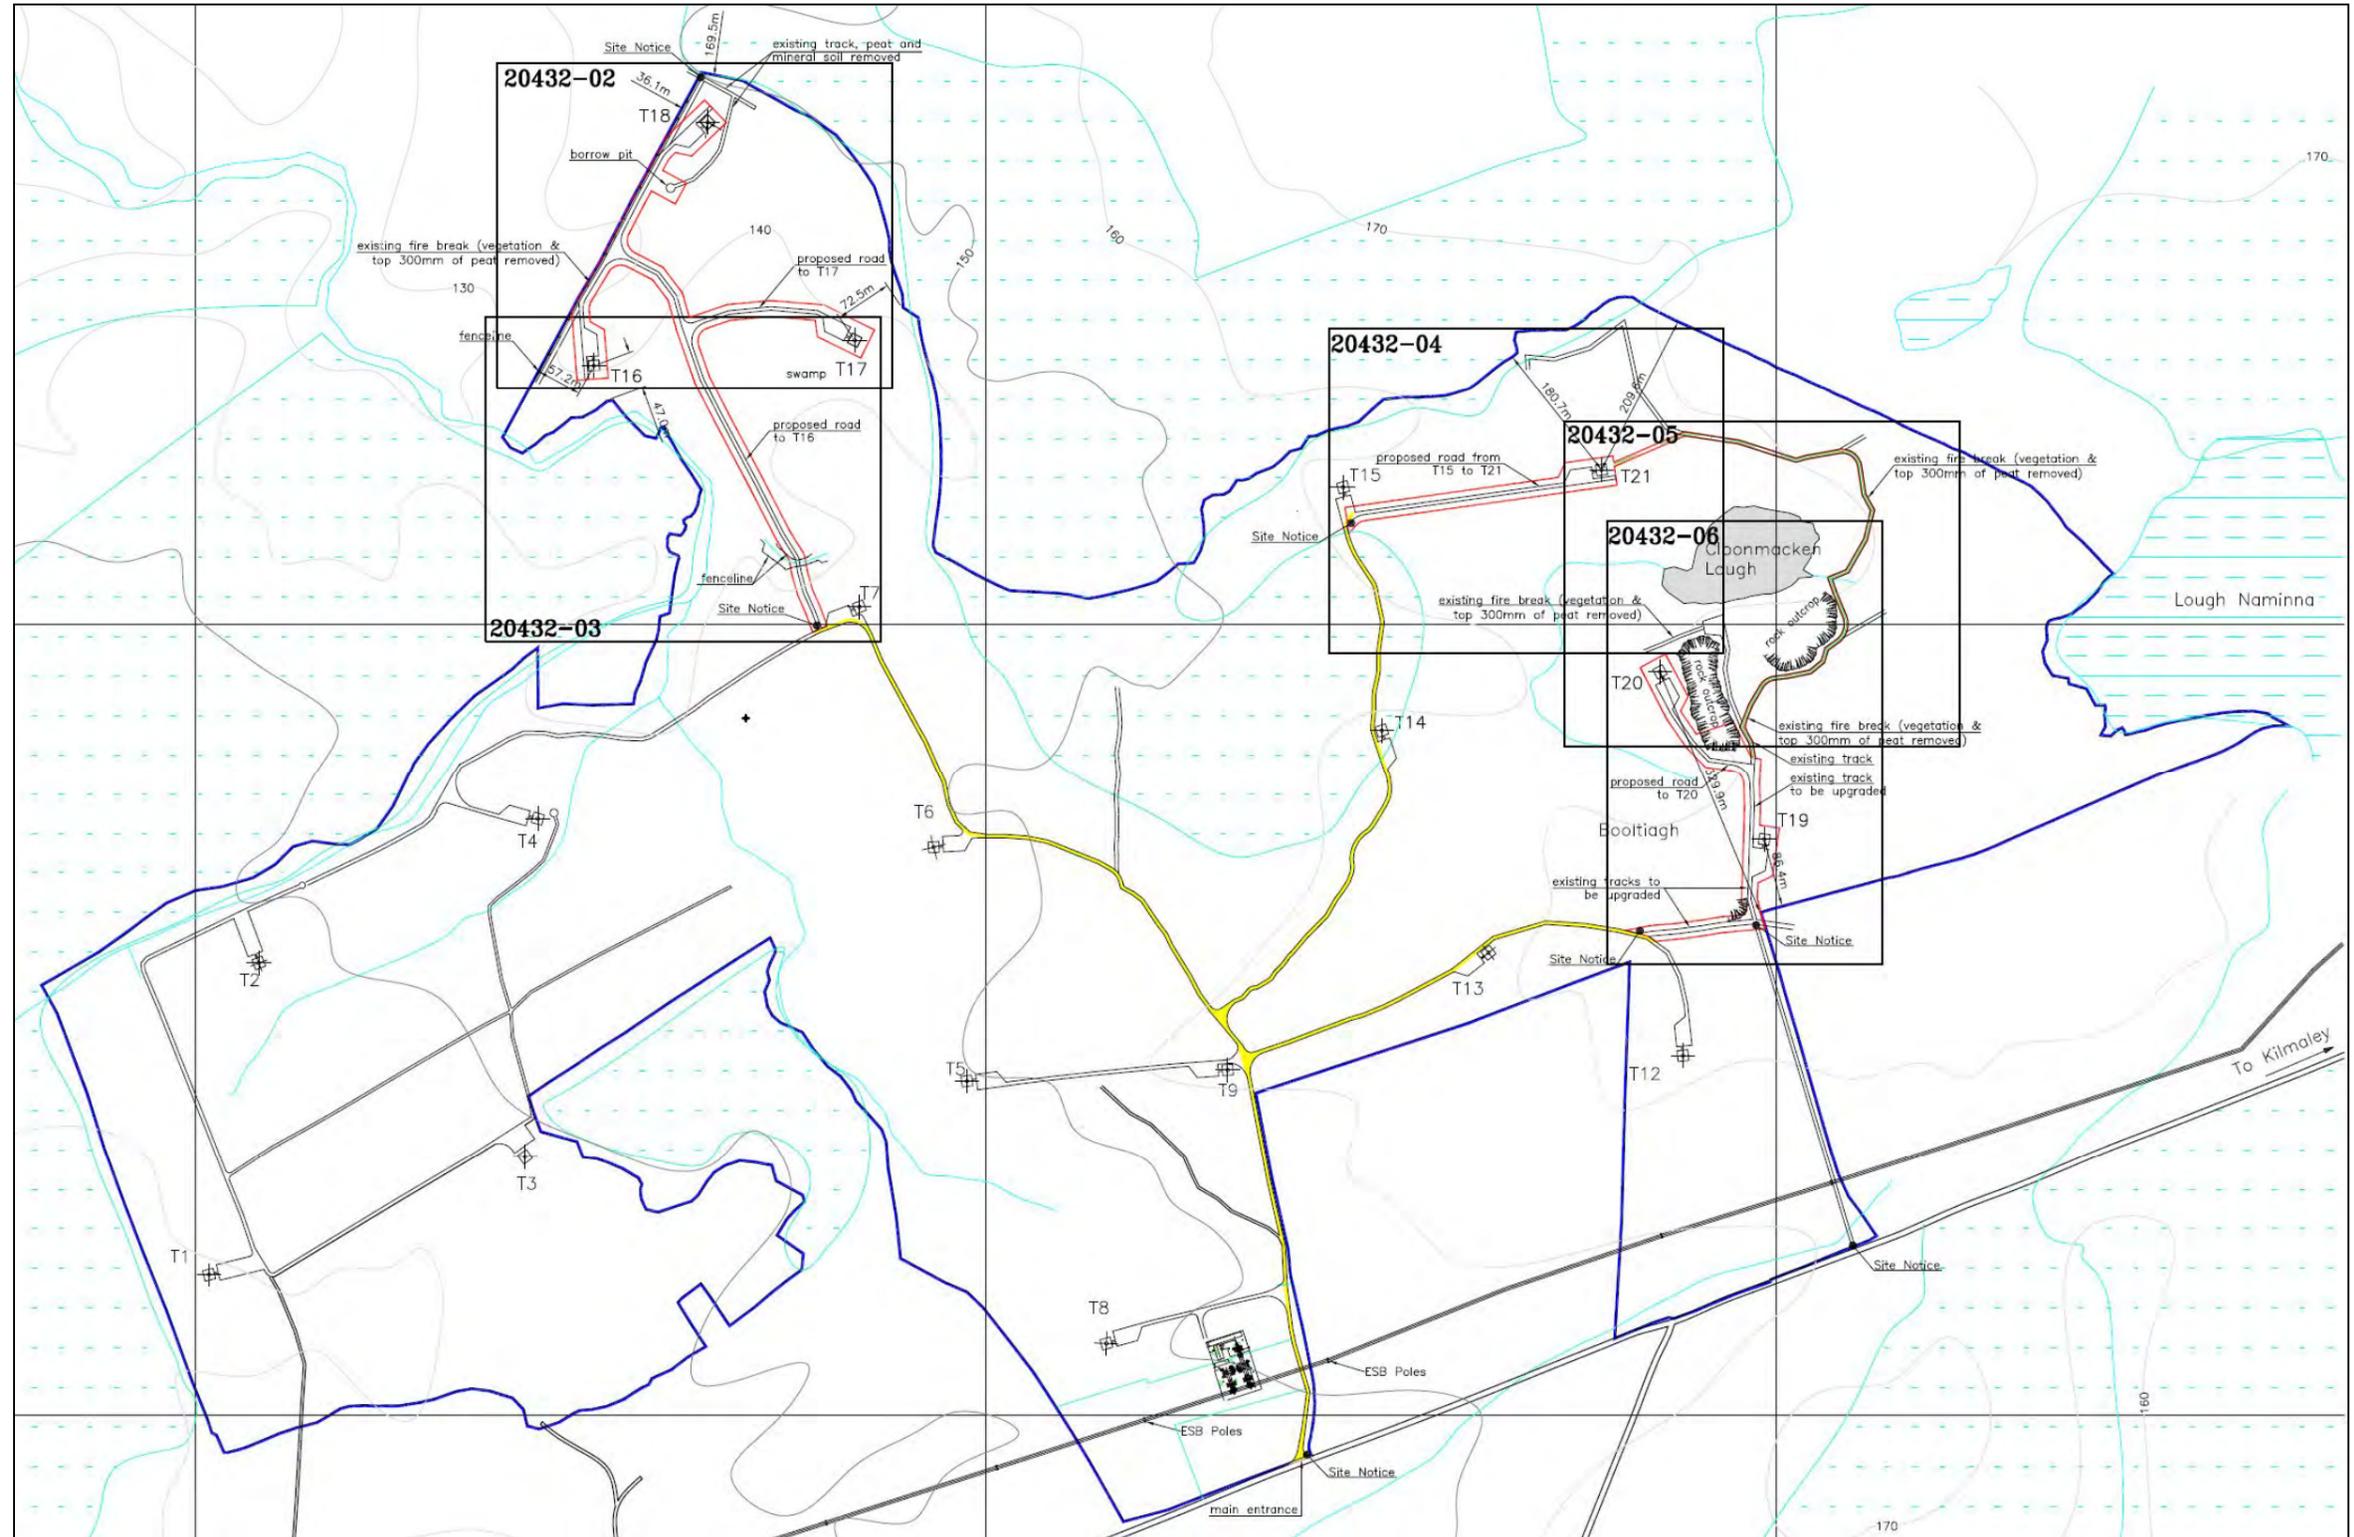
Site Layout Plan (Extract from Dwg No 20432-1)
